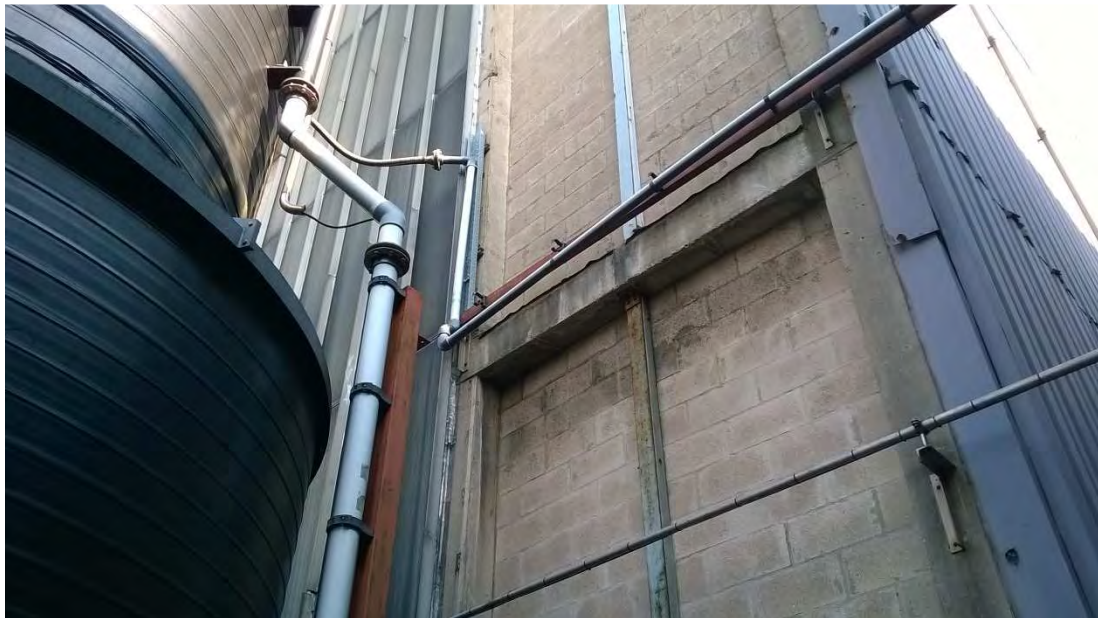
Caustic Day Tank – Damage to tank wall (1)
